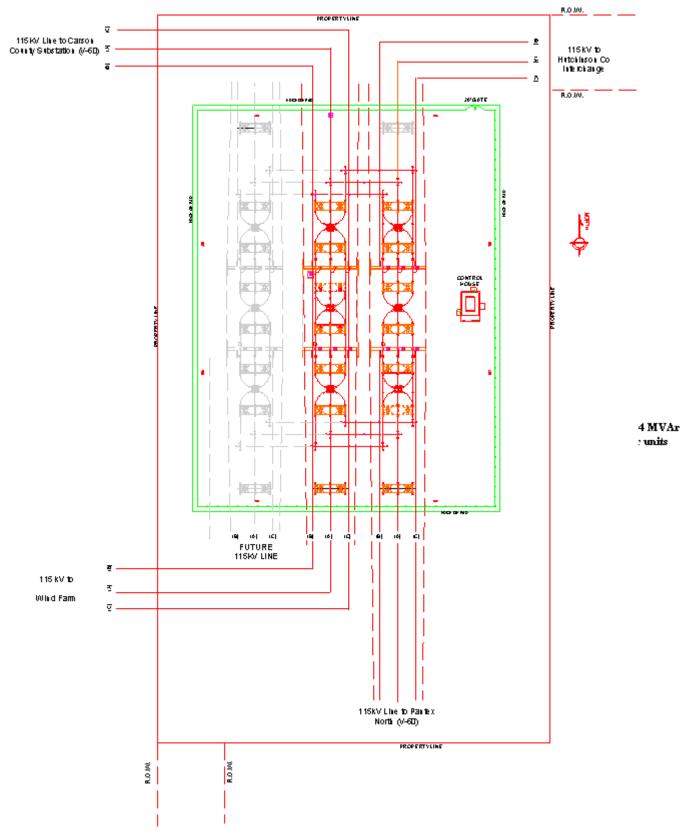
Site Layout 115 kV Switching Station Carson Co.
